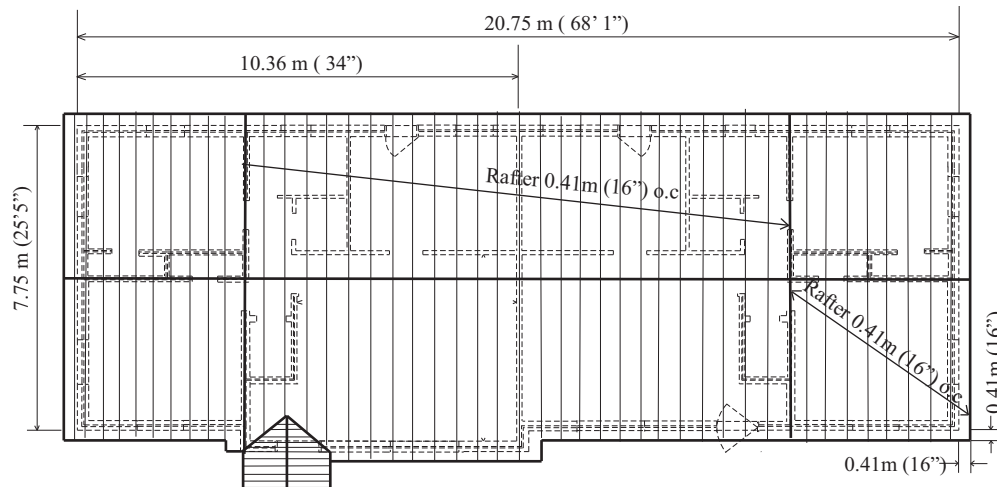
TYPICAL ROOF FRAMING PLAN OF THE STRUCTURES
